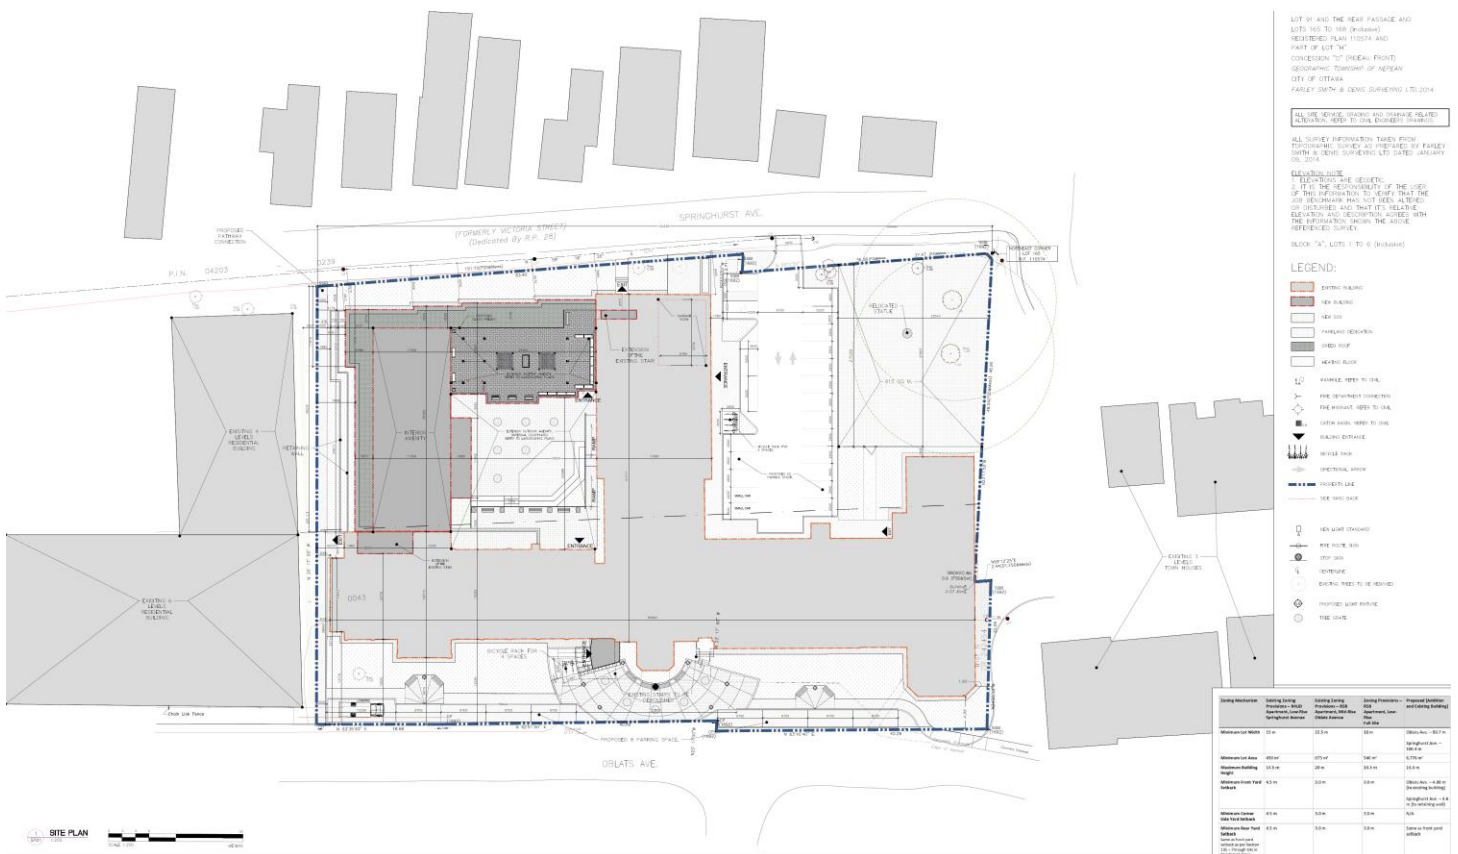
Site plan of the proposed development. The existing building that is subject to the conservation plan is outlined in orange, with proposed additions in red. The portion of the site in the northeast corner is dedicated parkland where the statue will be relocated. Source: Woodman Architects and Associates, August 18, 2022.
